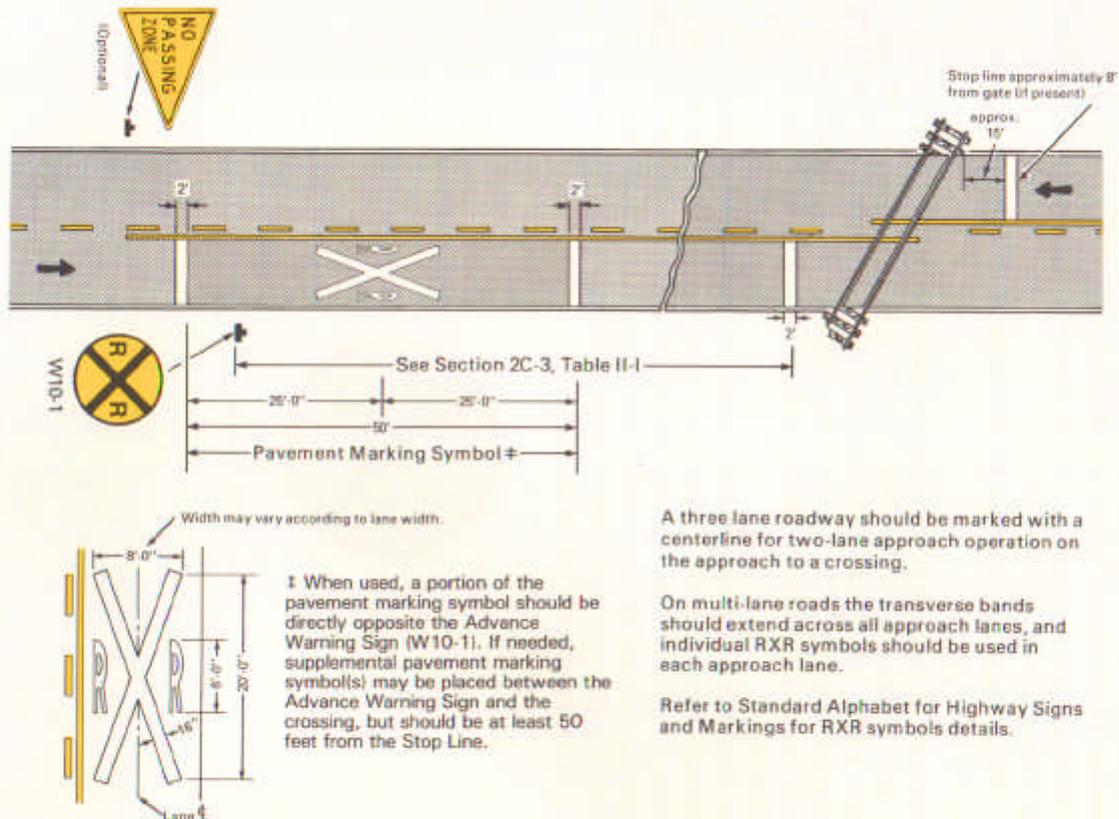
Typical placement of warning signs and pavement markings at railroad-highway grade crossings.
